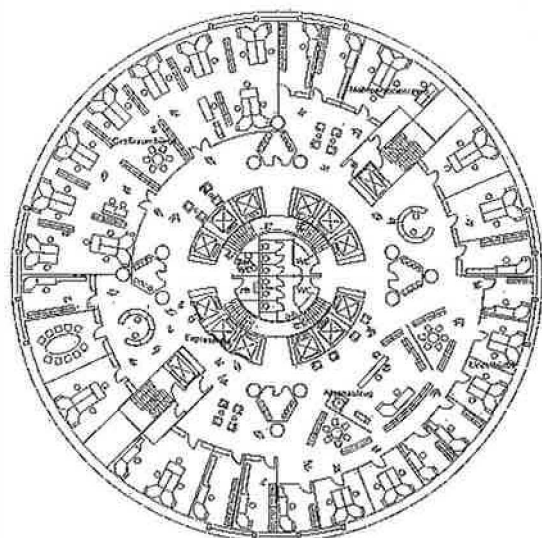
69.3 Typical floor plans for the ecological skyscraper by Ch. Ingenhoven, Düsseldorf
